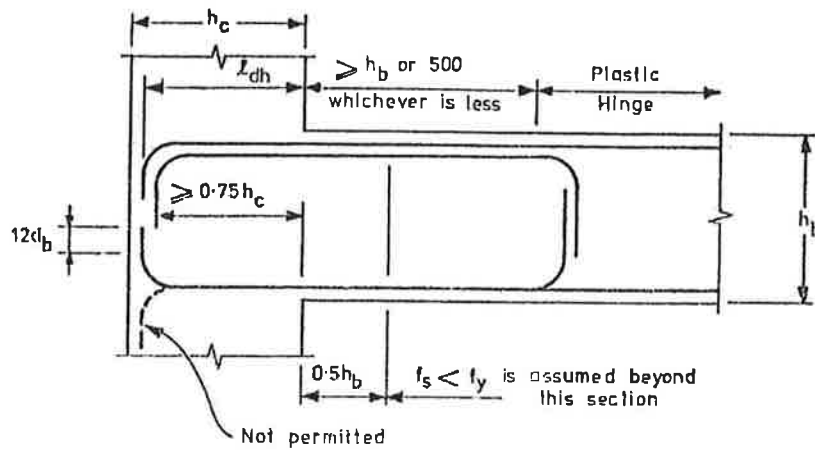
ANCHORAGE OF BEAM BARS WHEN THE CRITICAL SECTION OF THE PLASTIC HINGE IS AT A DISTANCE FROM THE COLUMN FACE OF AT LEAST THE BEAM DEPTH OR 500 mm, WHICHEVER IS LESS
